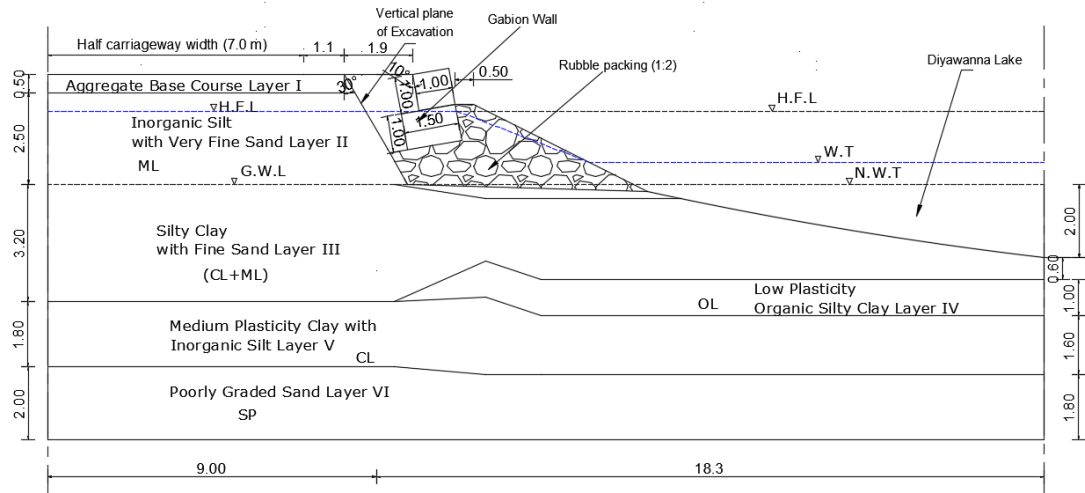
Proposed Gabion Wall section with Rubble packing at the toe
